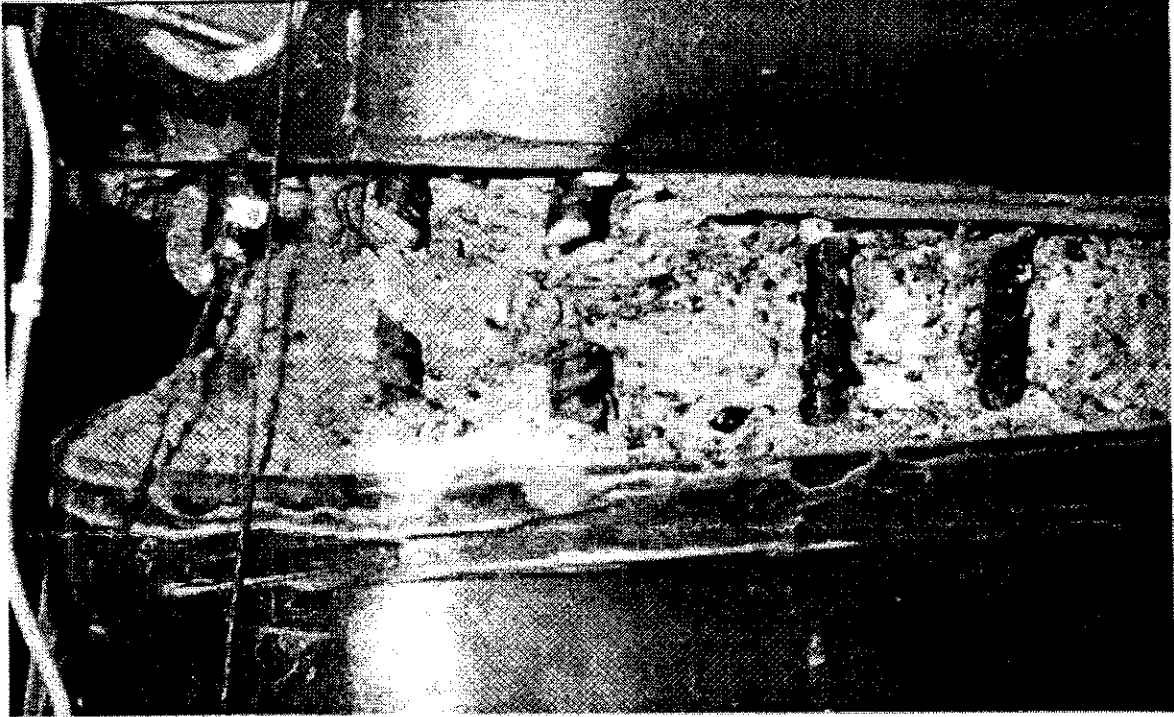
Specimen FR, After Testing, Bar Fractures
